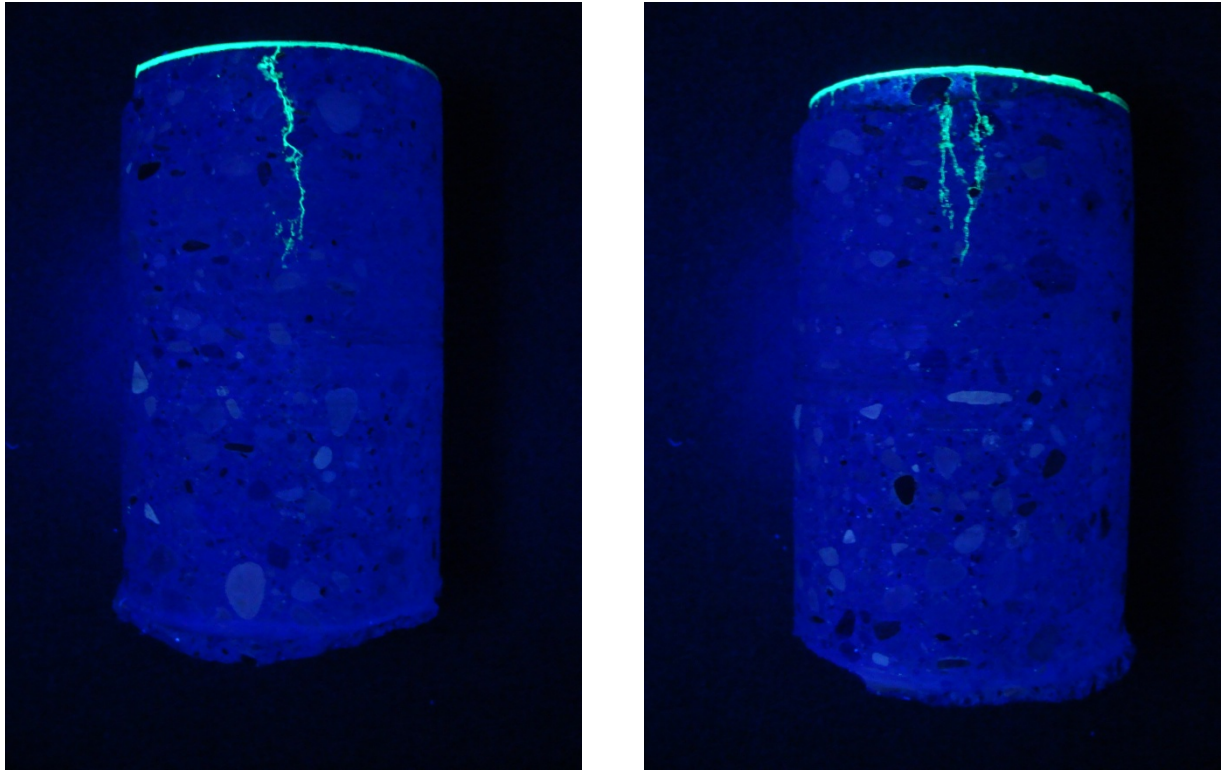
Core TS4 (left) northeast elevation; (right) south elevation
